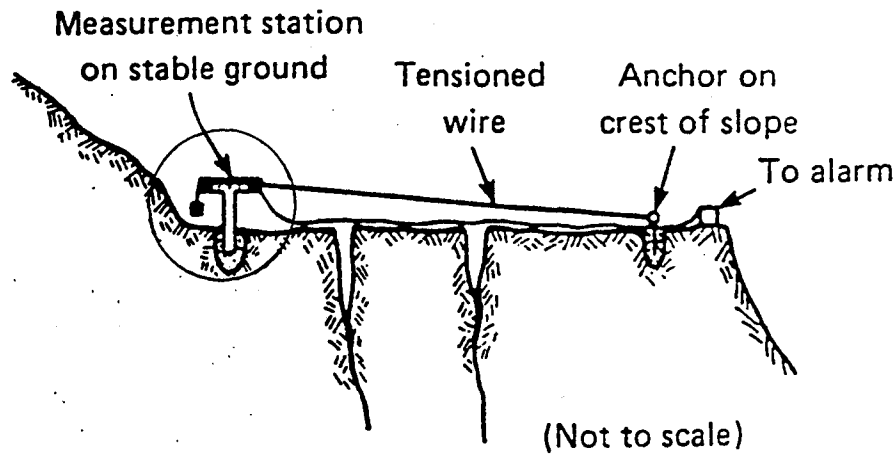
Mechanical Crack Gage, Using Pins and Tensioned Wire. (After Hoek and Bray, 1981)
